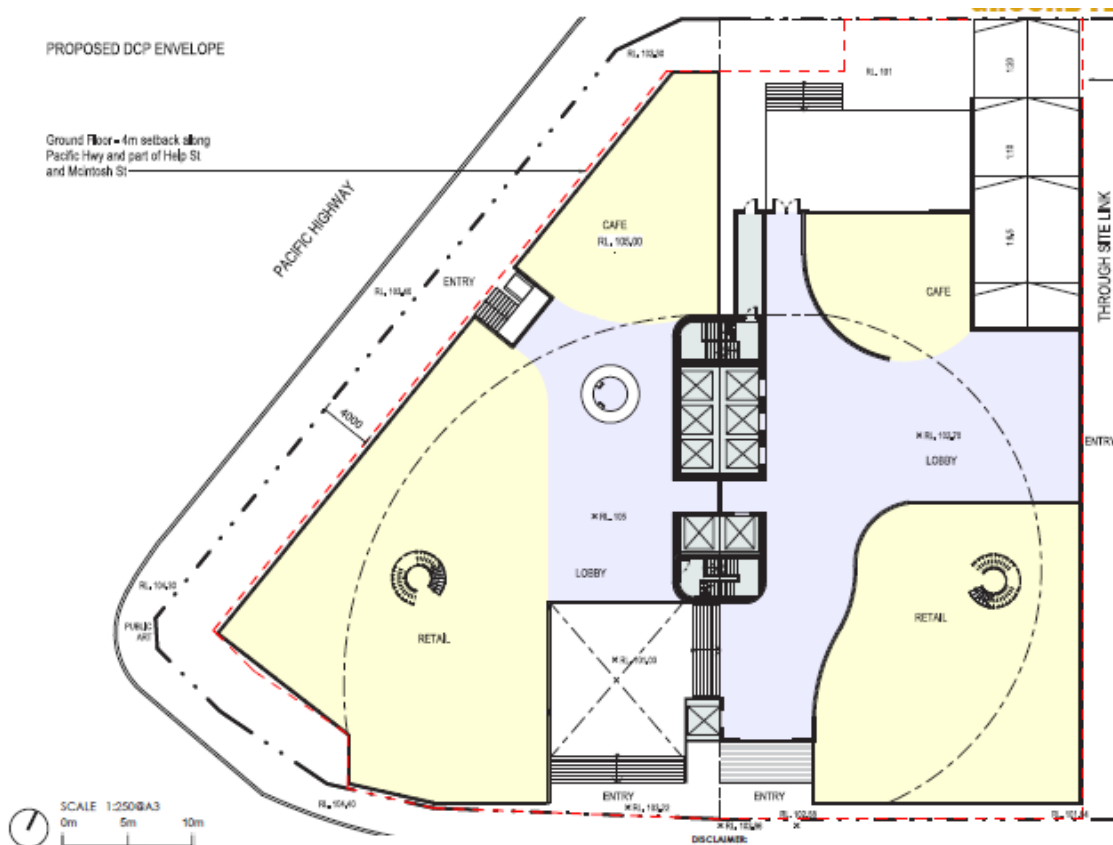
Proposed ground floor plan (source: a+ Design Group)
